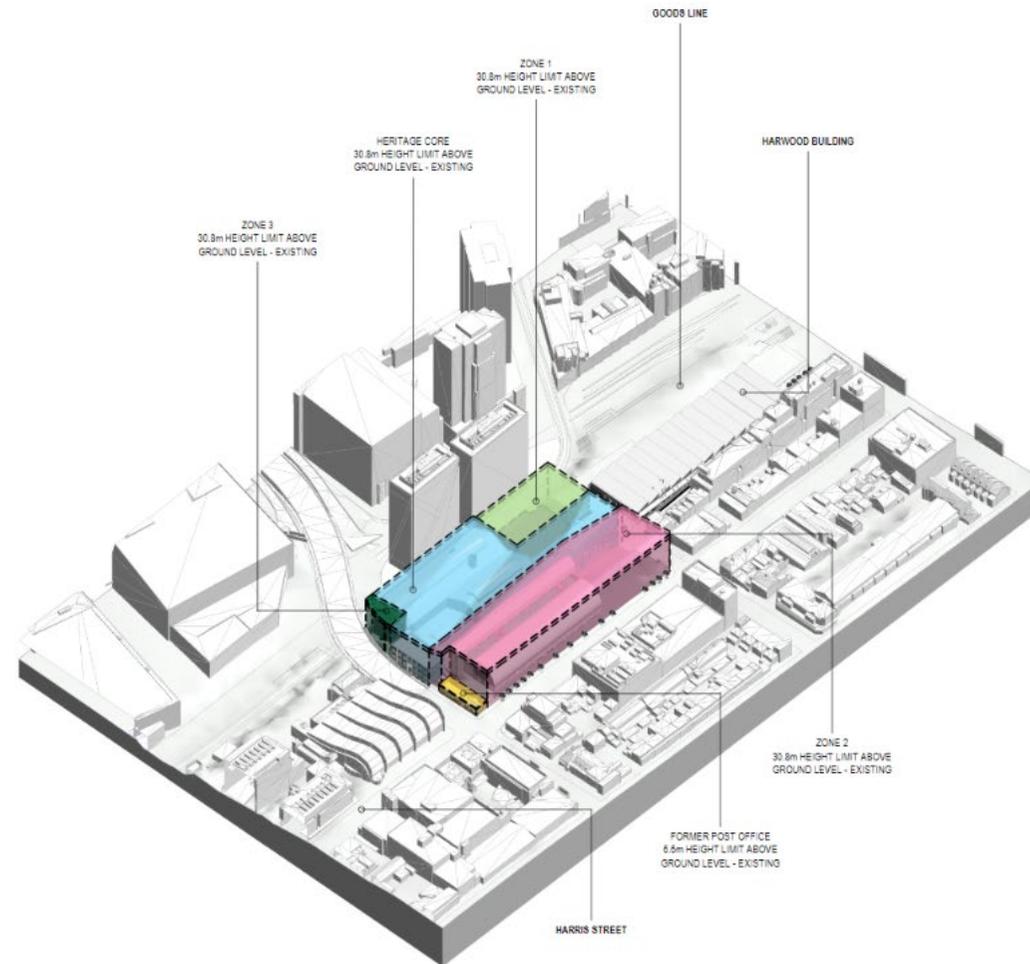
Ultimo Powerhouse- Building Envelope 3D Views (Source: John Wardle Architects 2022)
